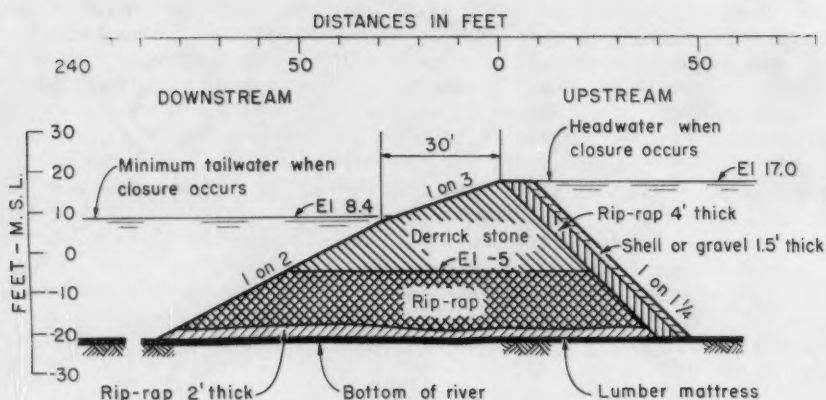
CROSS SECTION OF ROCK FILL DAM
